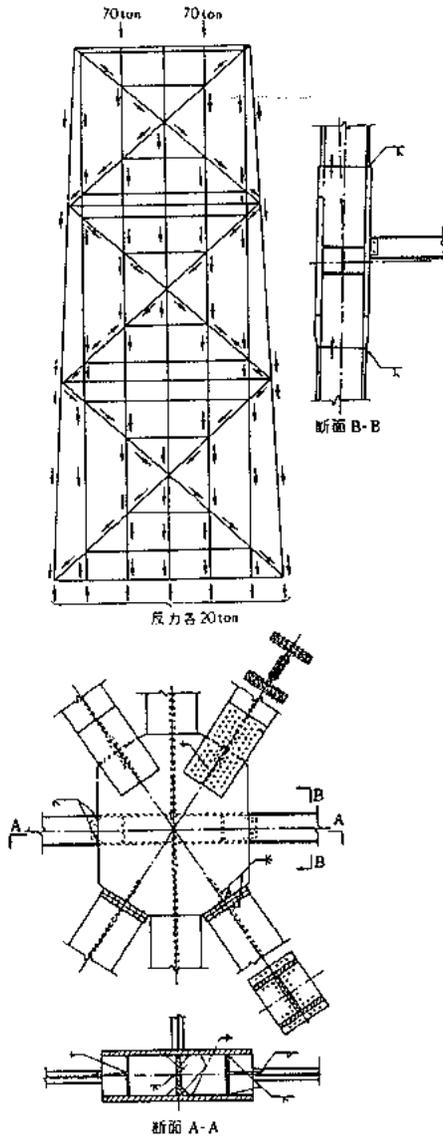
Details of trusses, claddings and windows Fig. 6 Force distribution to columns and Details
